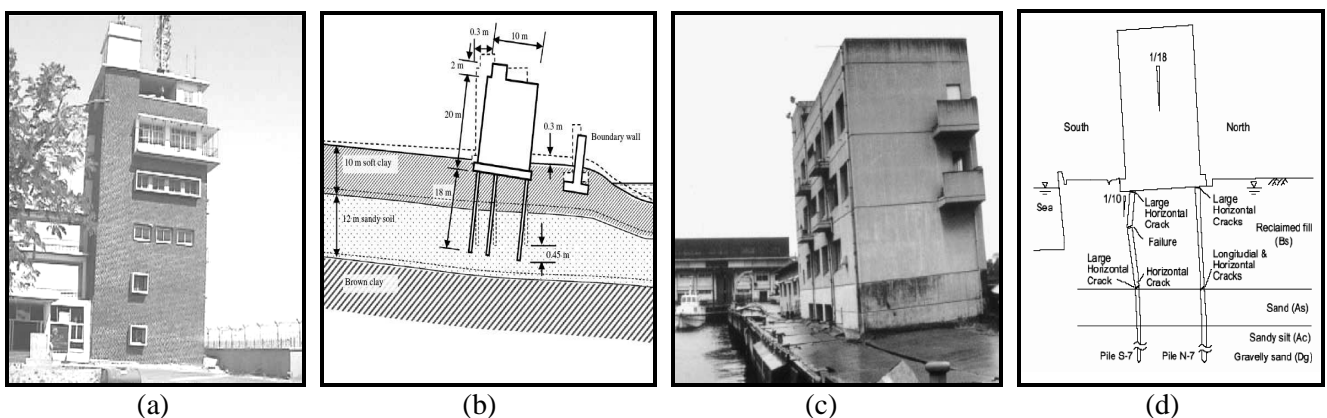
(a) Tilting of Customs Tower House following the 2001 Bhuj EQ, Dash et al (2008); (b) Schematic diagram of failure of 1(a); (c) Tilting of Pile-supported building following the 1995 Kobe EQ, Bhattacharya (2006); (d) Schematic diagram of failure of 1(c)
